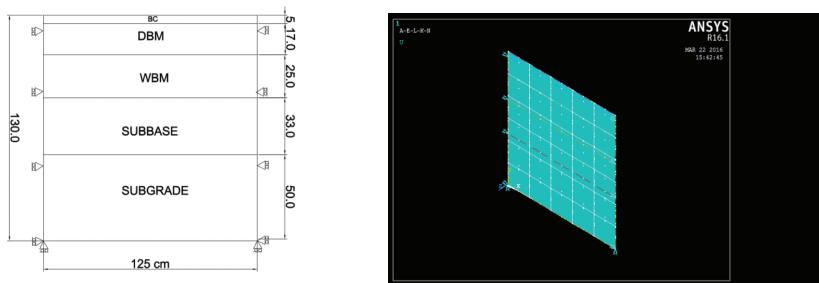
Pavement Section. a - Finite Element of Pavement Section; b - Boundary Condition of FE Model
